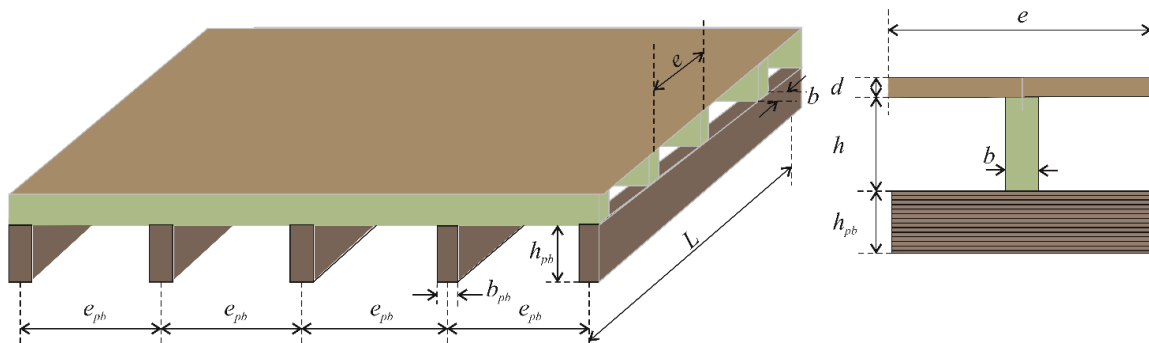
A timber floor joist with glulam beams, secondary sawn timber beams and sheathing.
